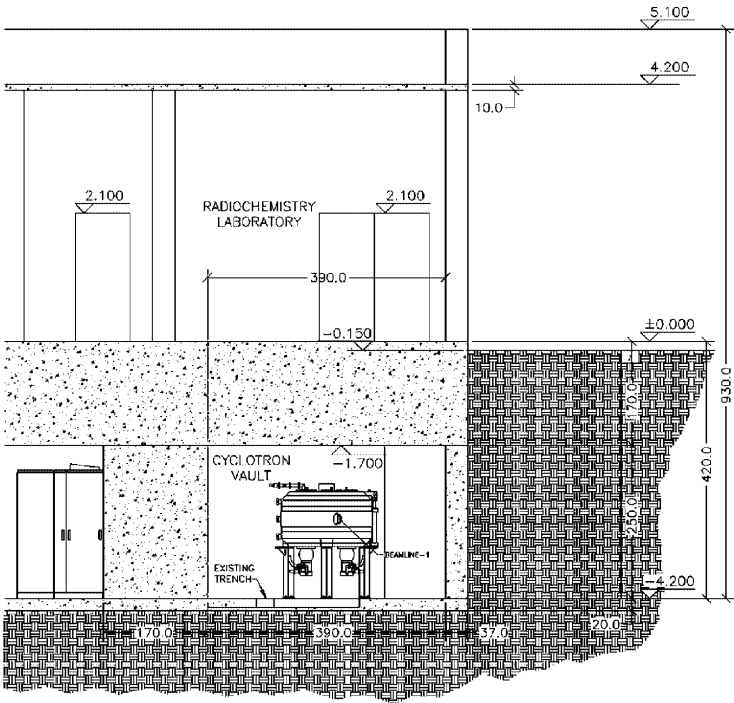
Elevation view of the PET facility showing both B1 and first floor.
